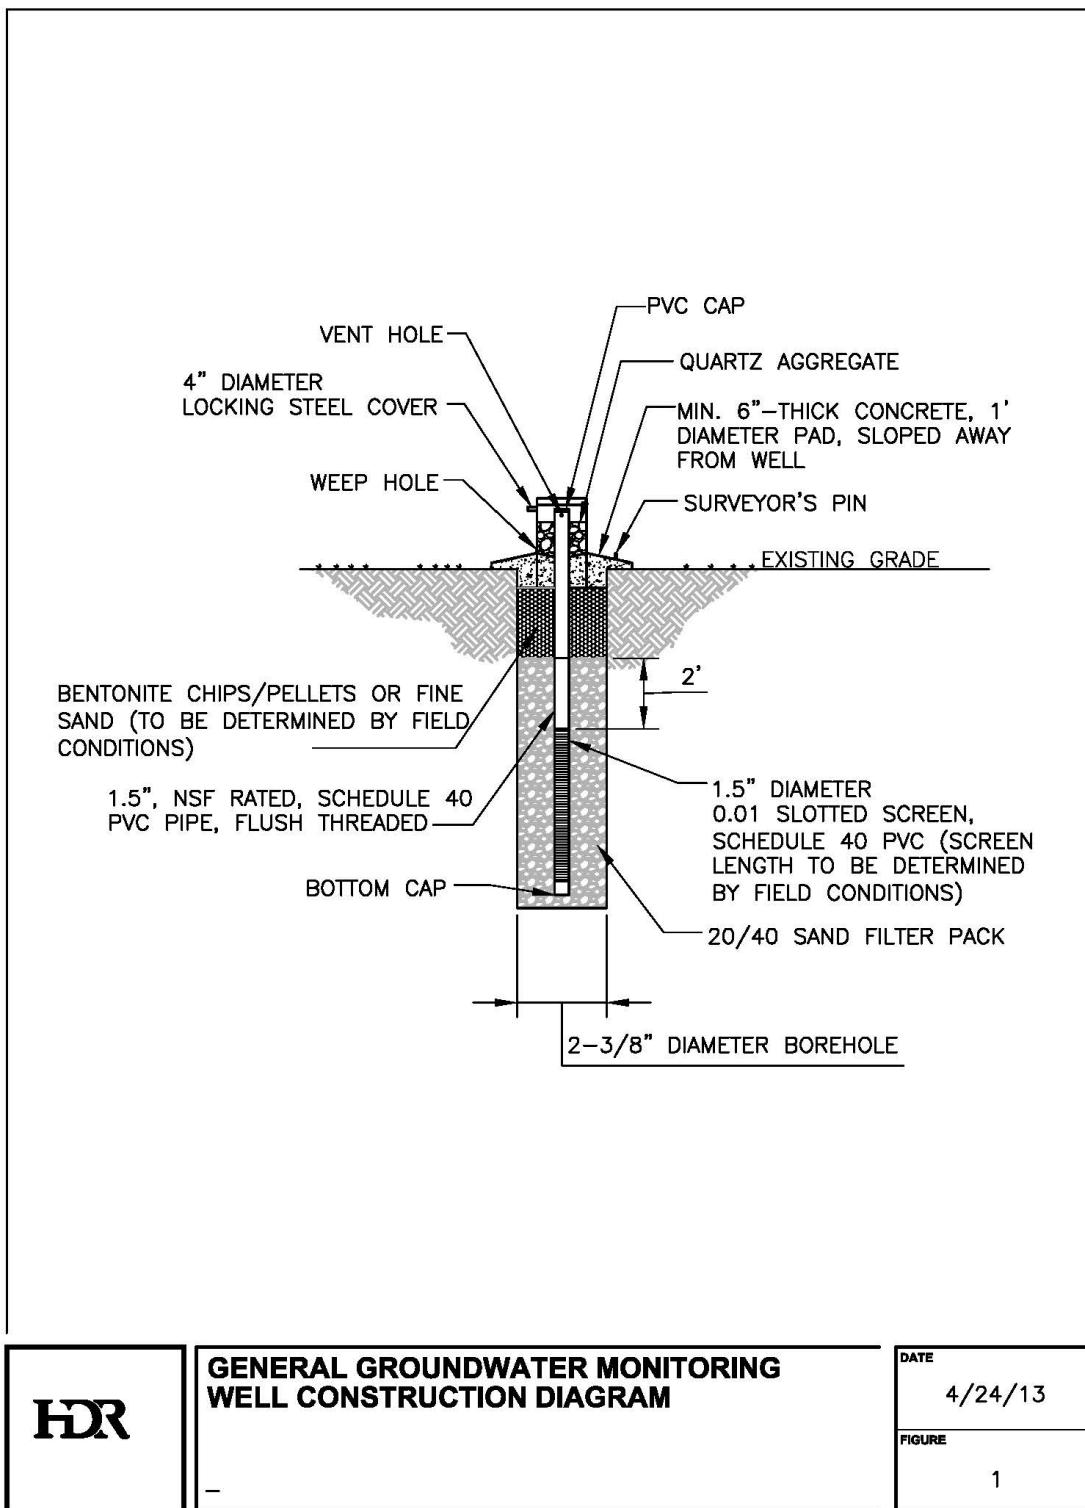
Groundwater Monitoring Well Construction Diagram (typical)
